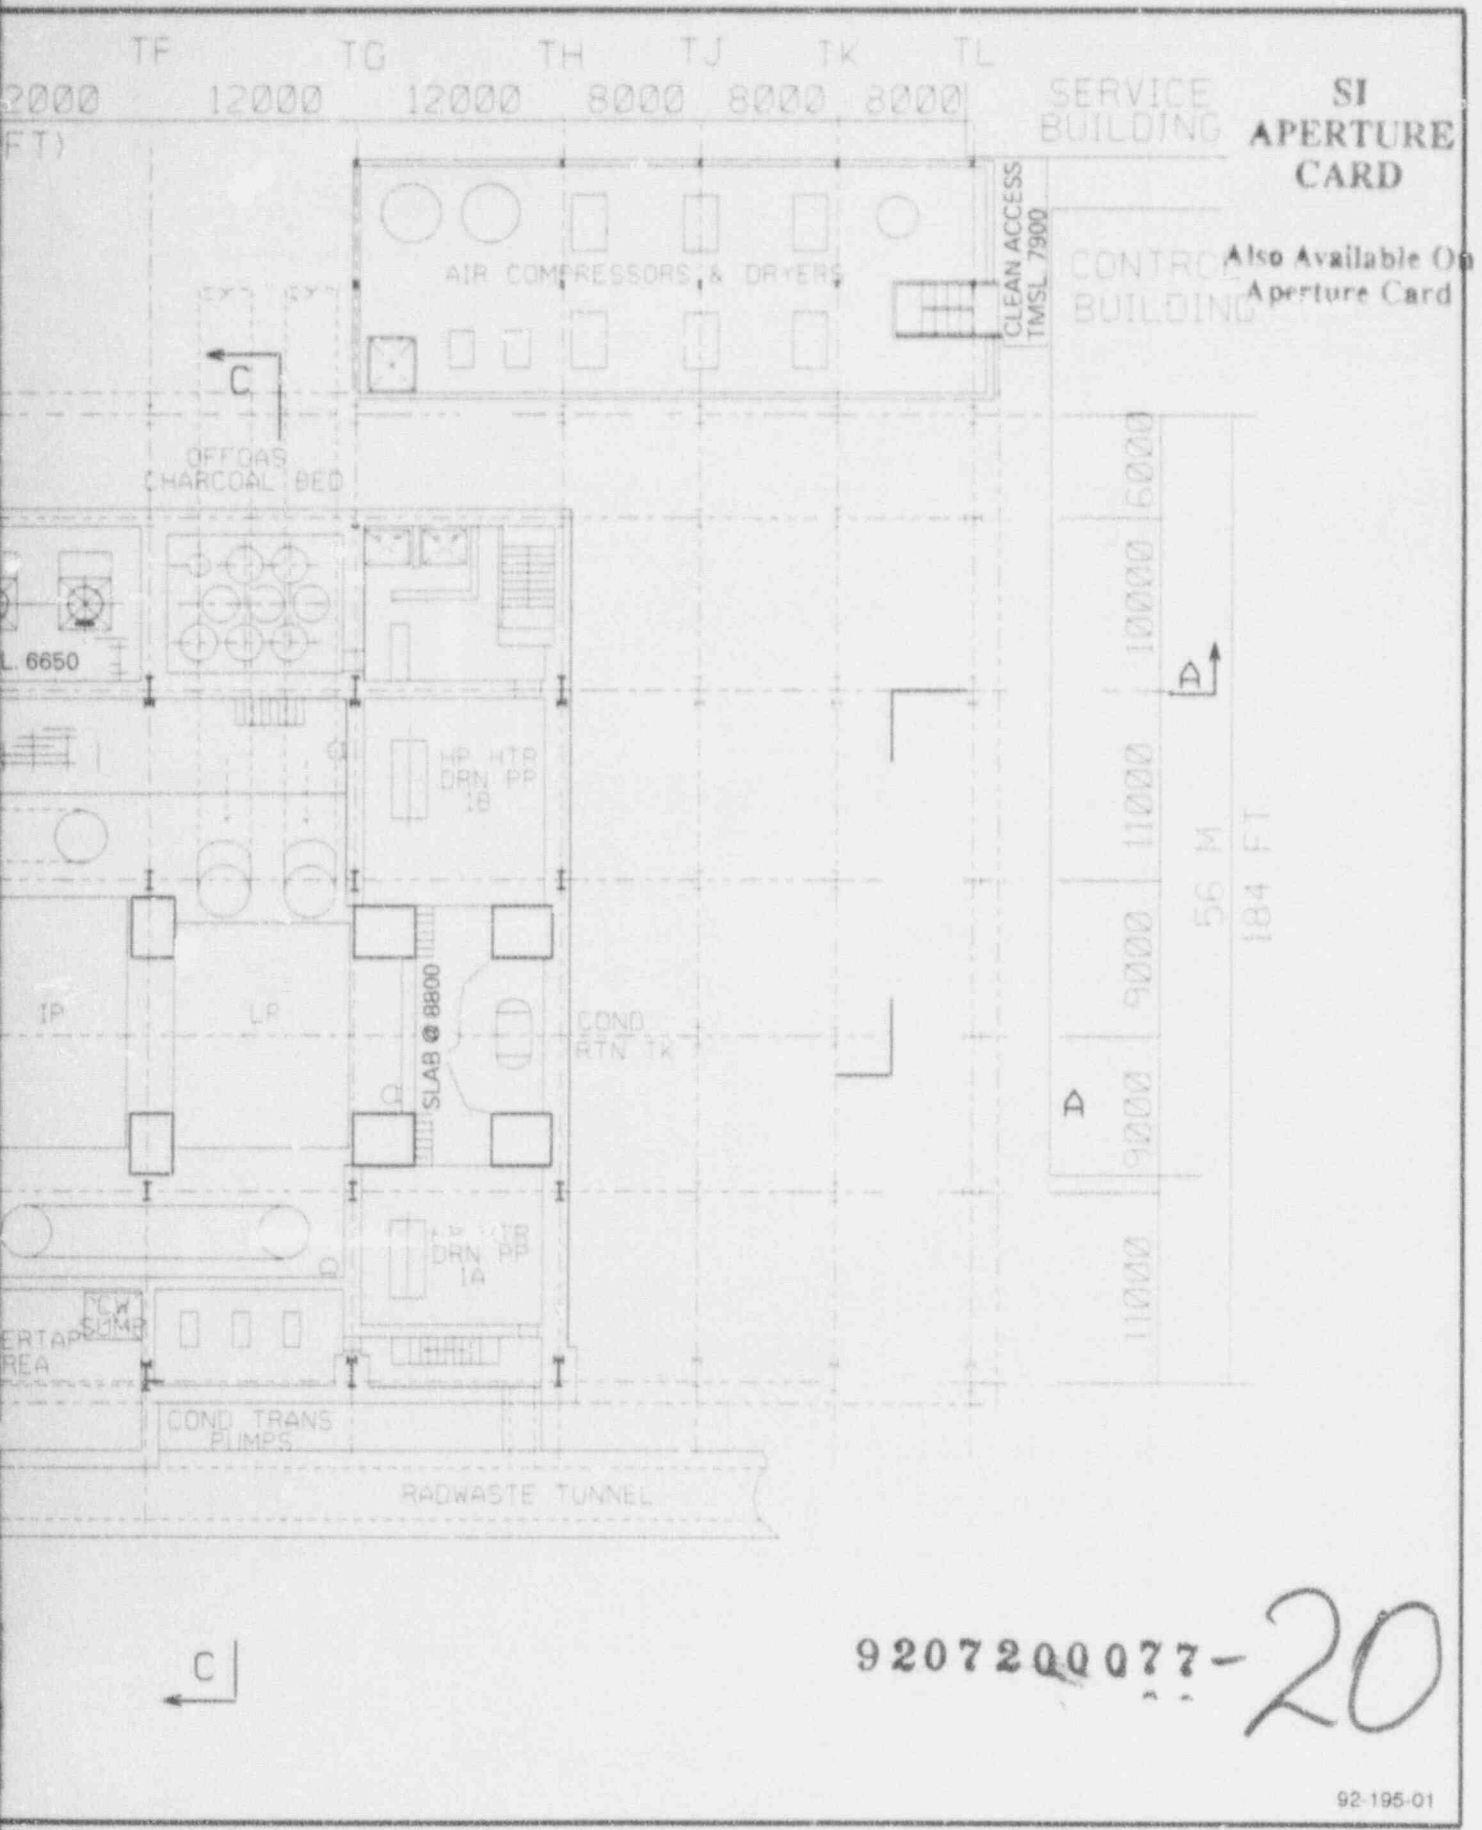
TURBINE BUILDING, GENERAL ARRANGEMENT AT ELEVATION 5300mm
